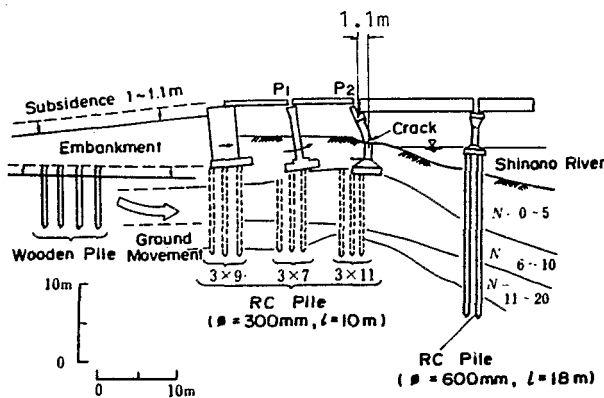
Damage to Yachiyo Bridge in 1964 Niigata, Japan earthquake (Hamada, 1992a).
